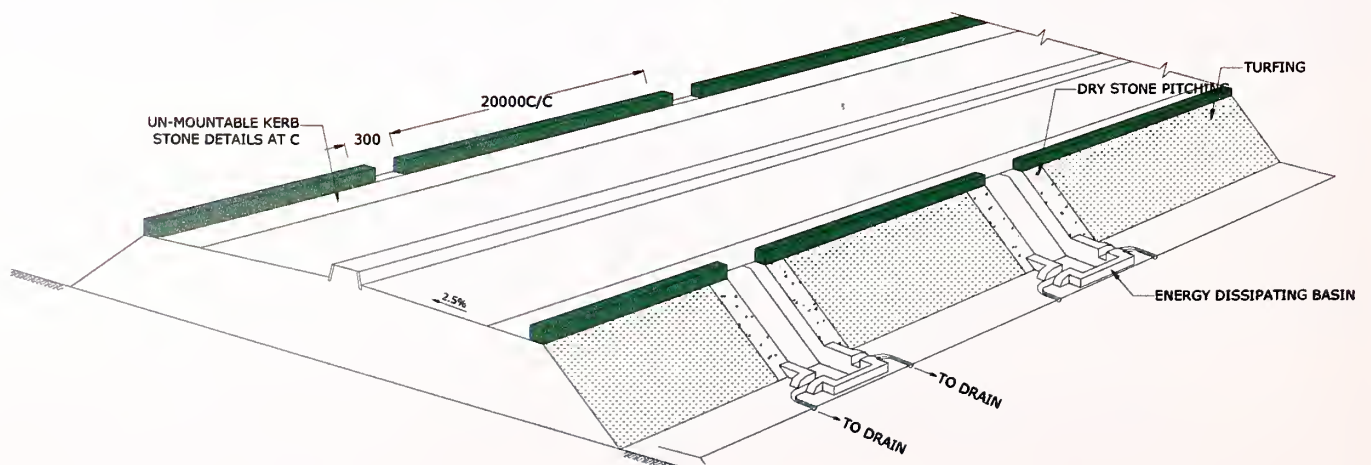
A Schematic View of Slope Protection Arrangement with Plain Chute/Flume
